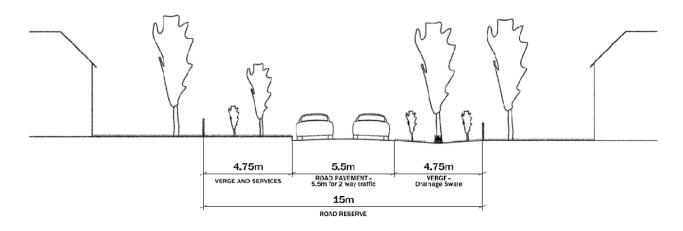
Cross section for typical internal 15m road reserve for access streets.
